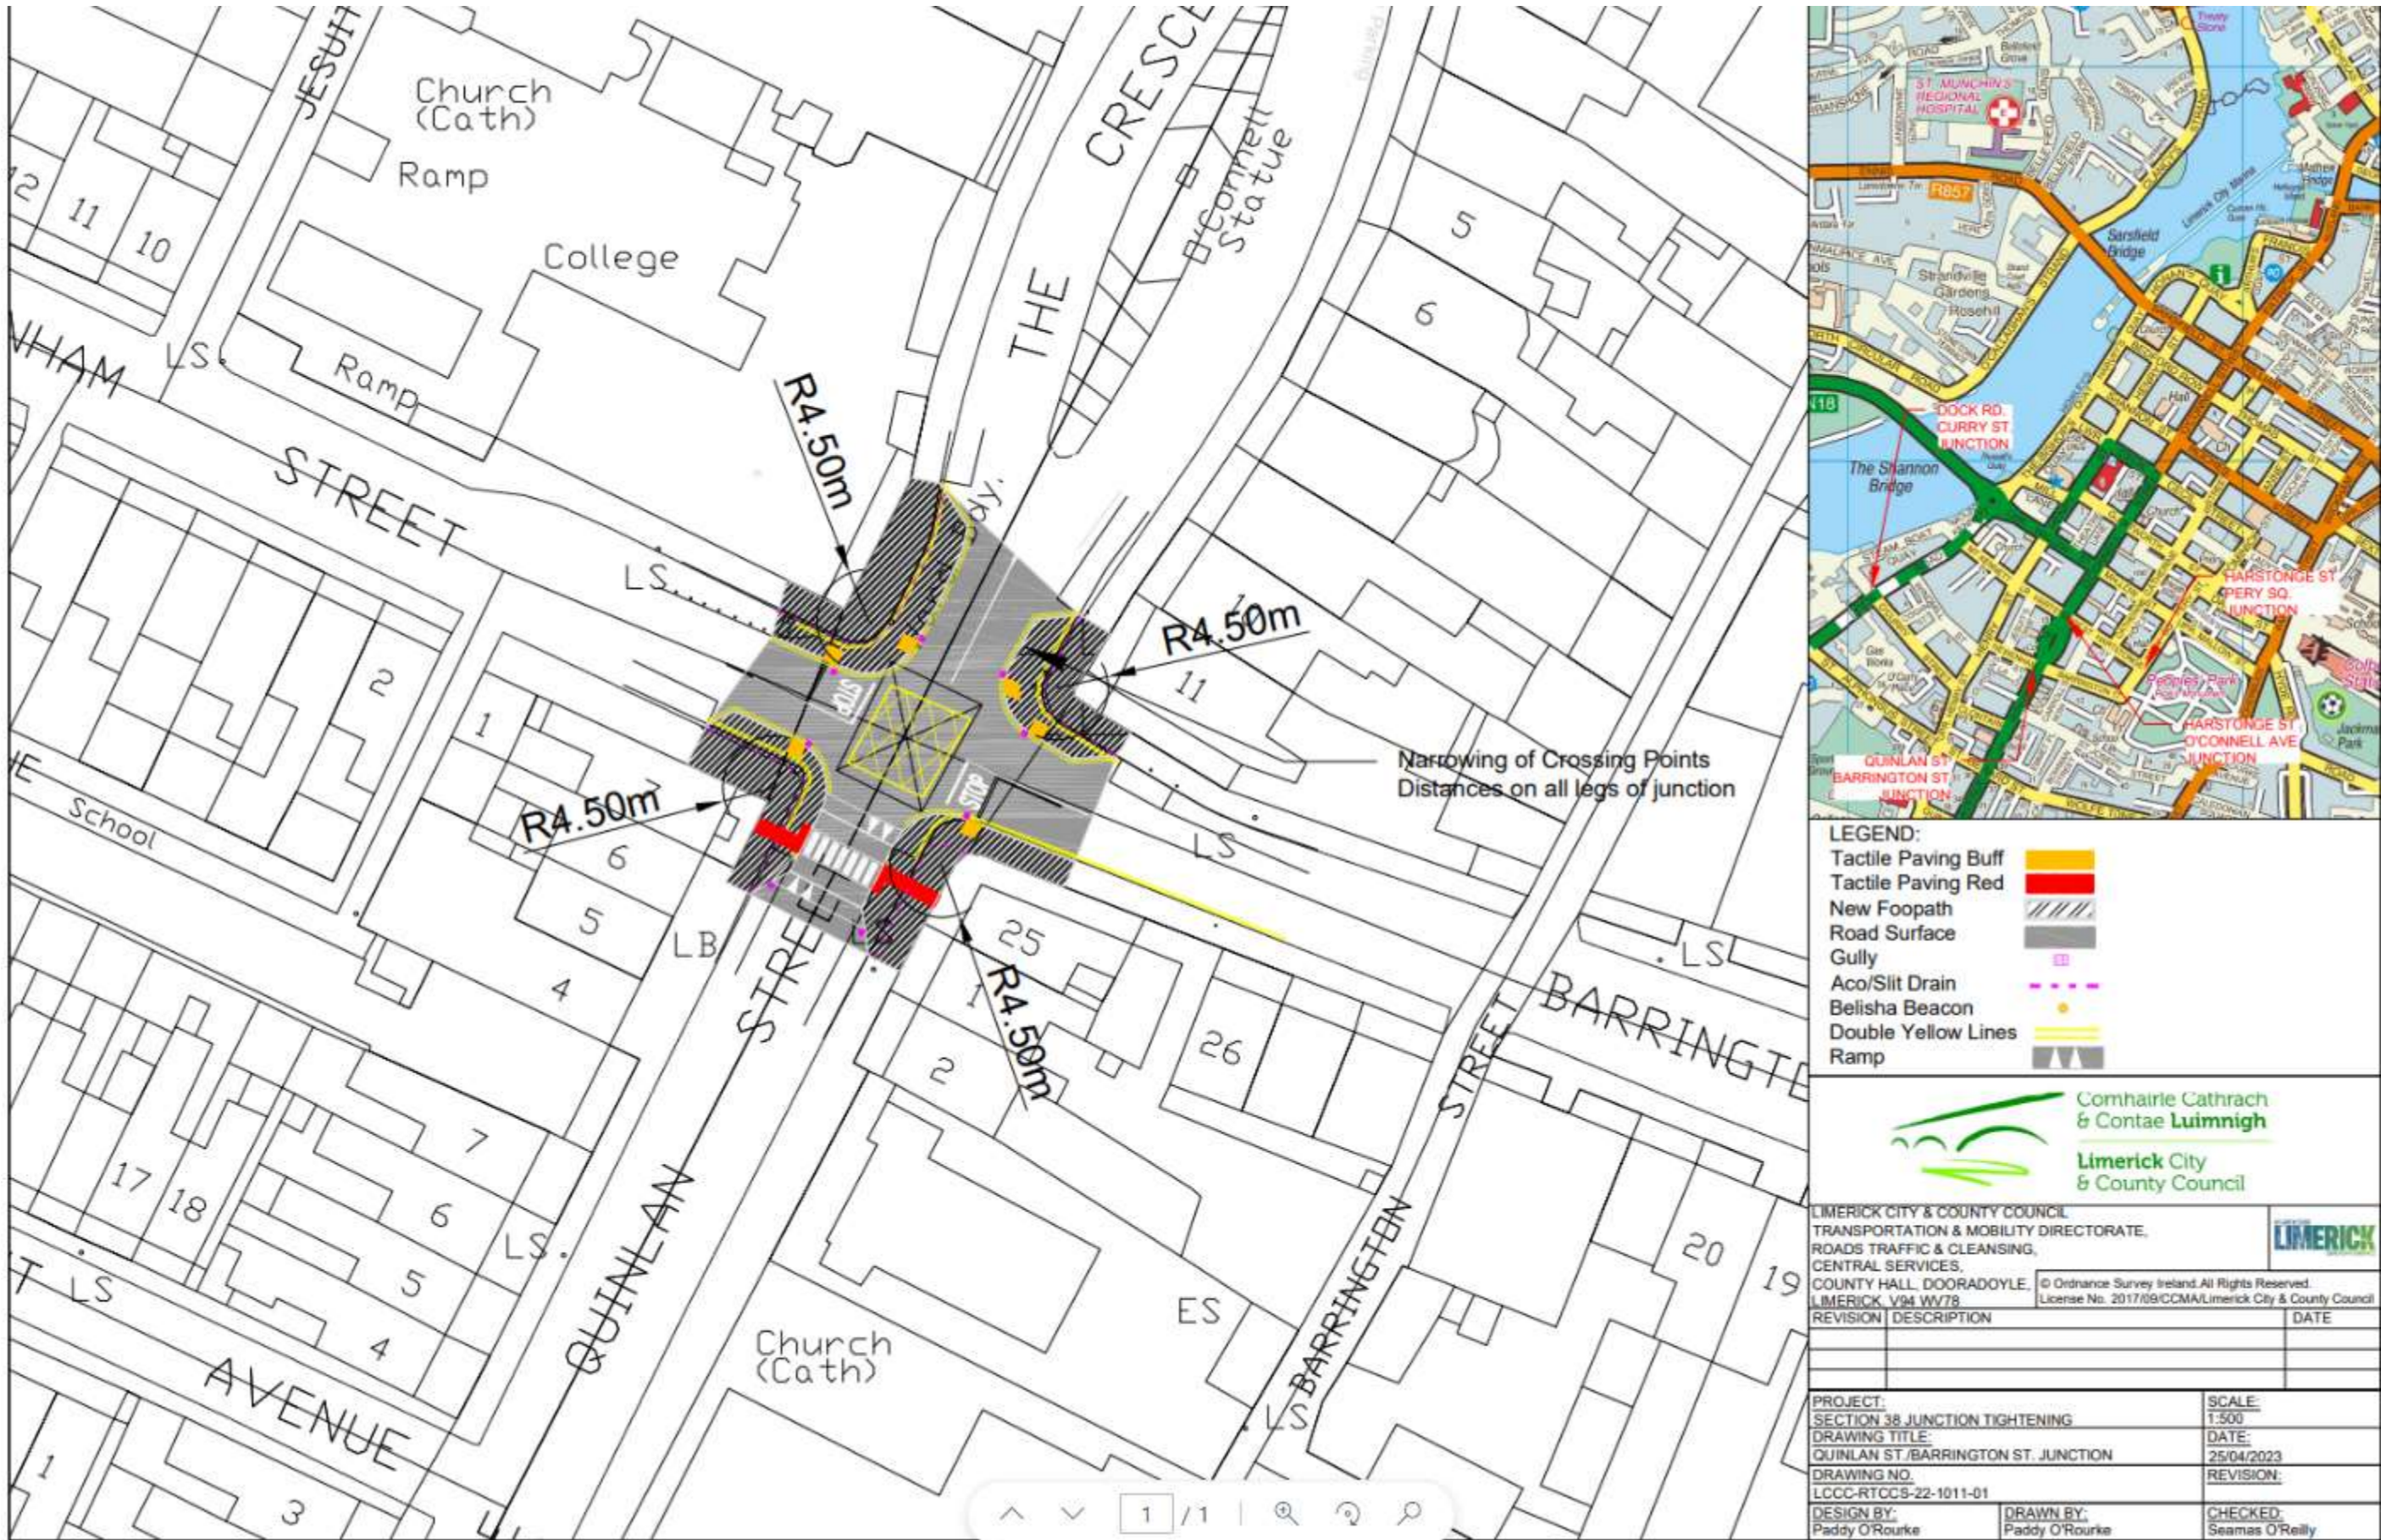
Quinlan Street / Barrington Street Junction Tightening / Pedestrian crossing
